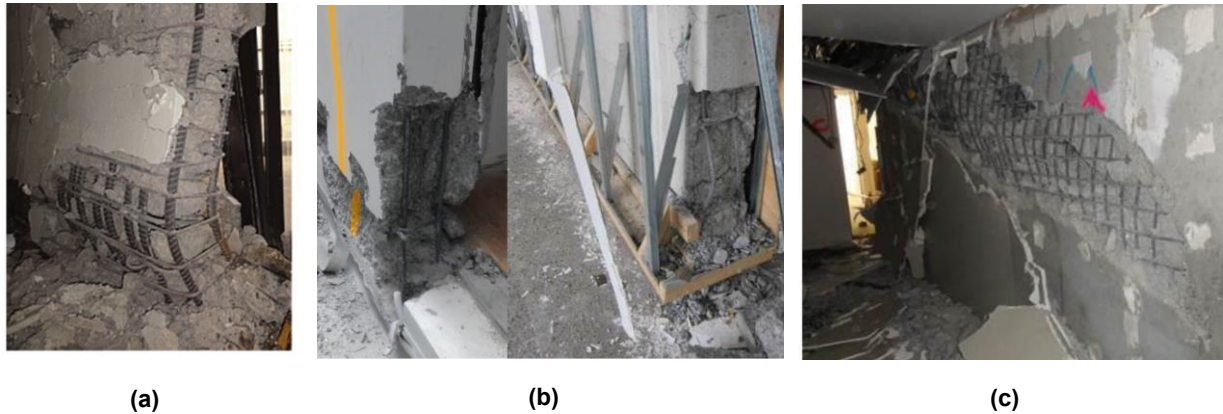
Wall damage in the the 2010-11 Canterbury earthquake sequence: (a) buckling of well-confined wall (Elwood 2013); (b) bar buckling and fracture (Kam et al. 2011); (c) shear-axial failure (Kam et al. 2011)
